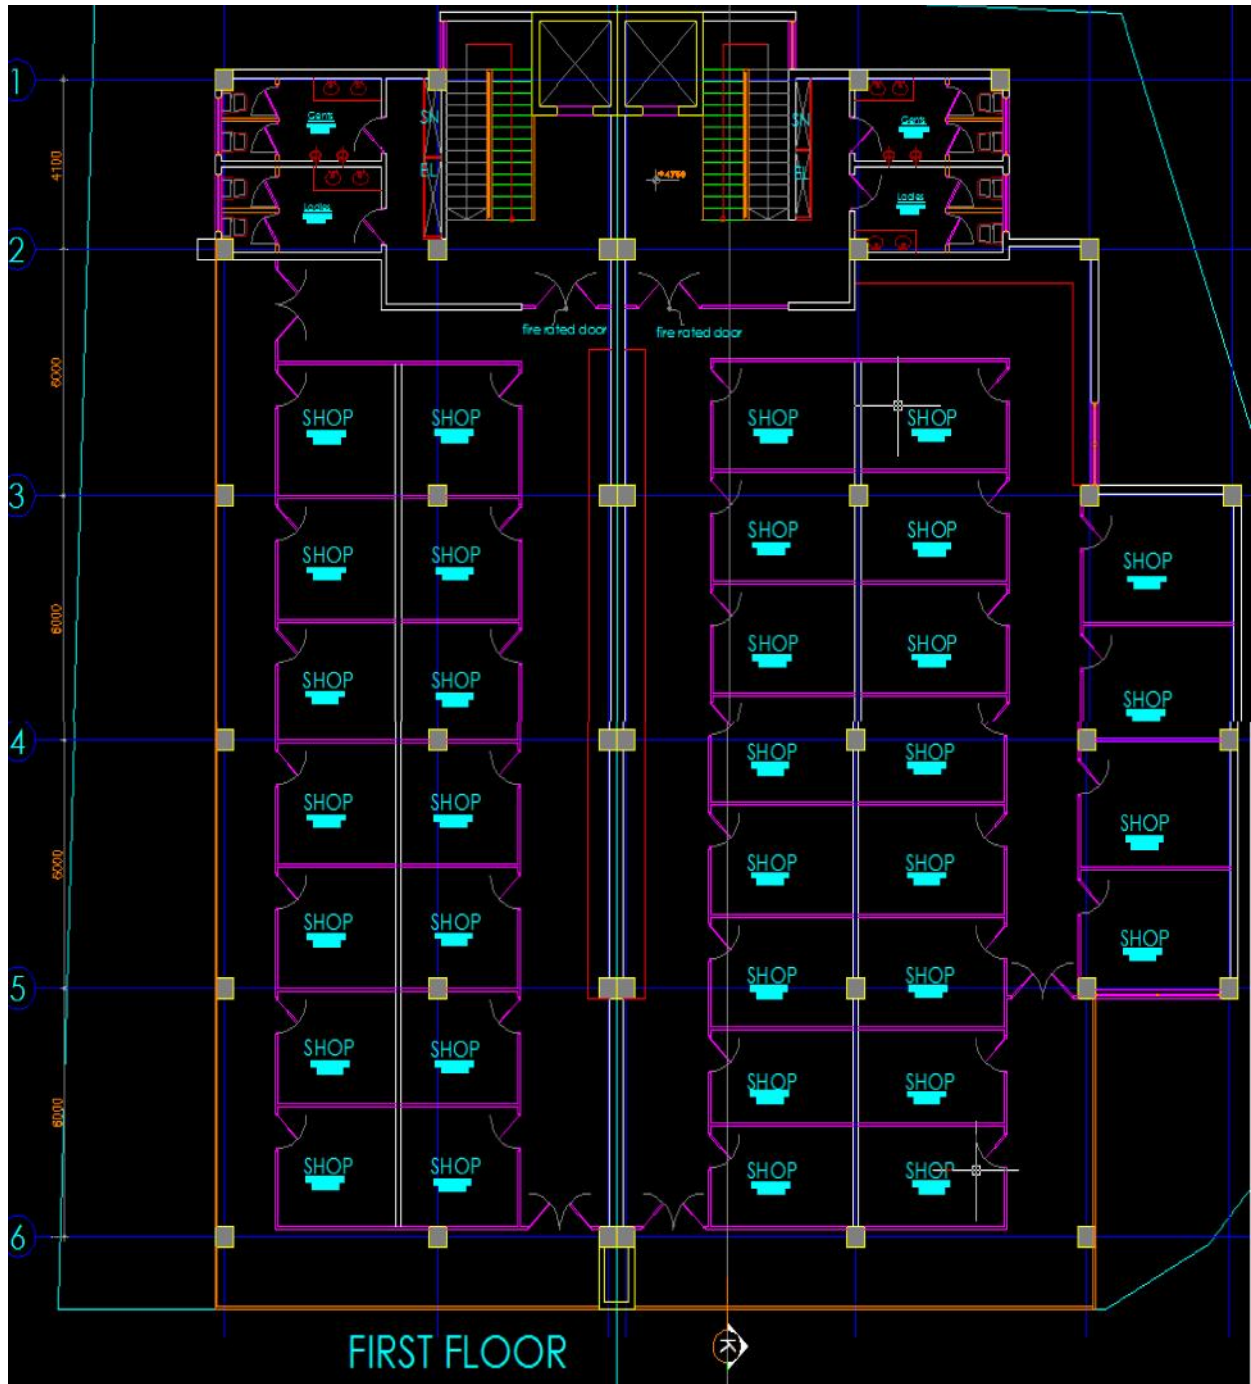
Floor Plan for Shop Building Located in Merkato
